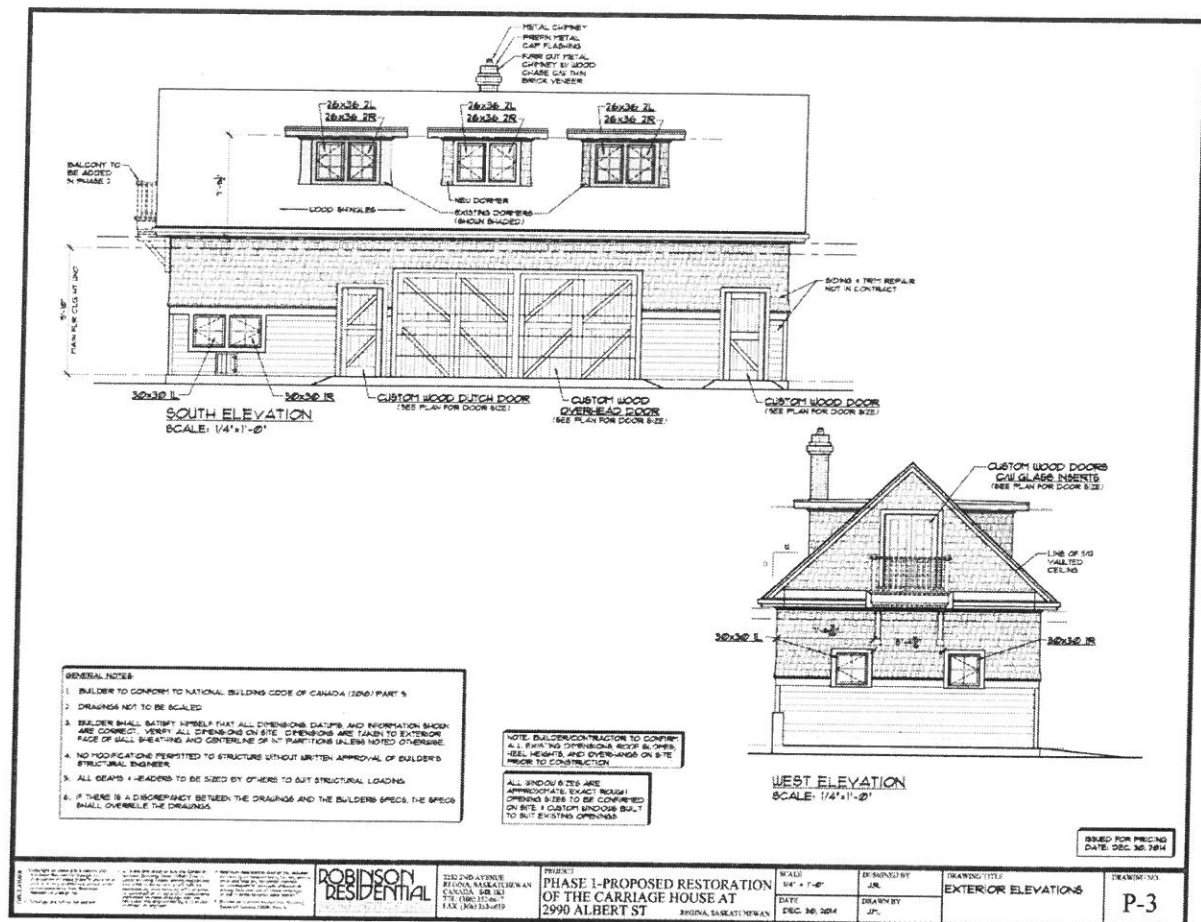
The south and west elevations of the carriage house after the proposed rehabilitation.
